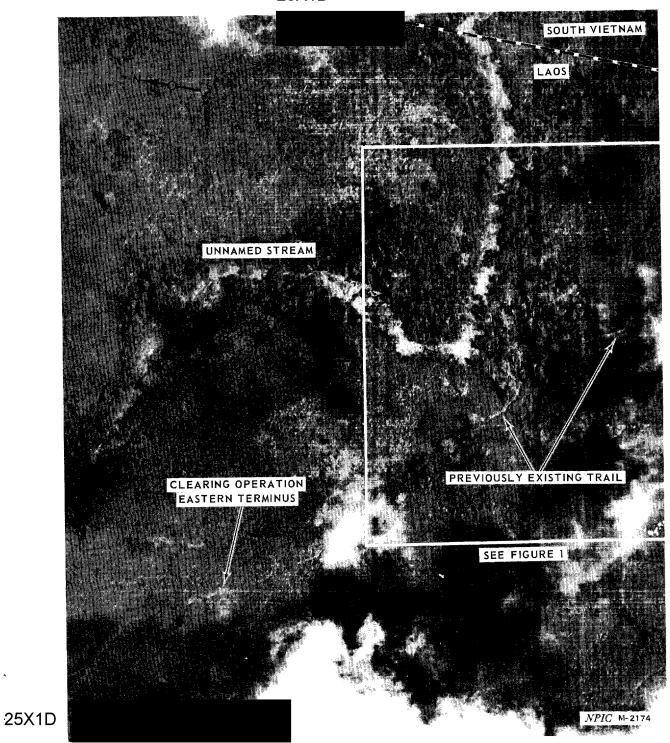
ROAD CONSTRUCTION, ROUTE 92 EXTENSION, LAOS/SOUTH VIETNAM BORDER
